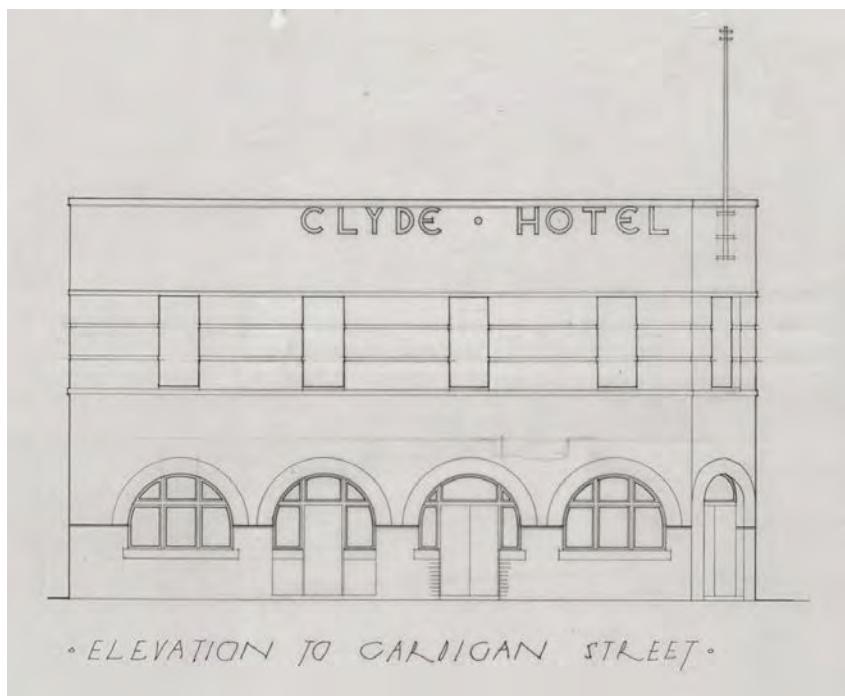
Detail of plan of 1940 renovation works to the Clyde Hotel, designed by Robert H McIntyre
